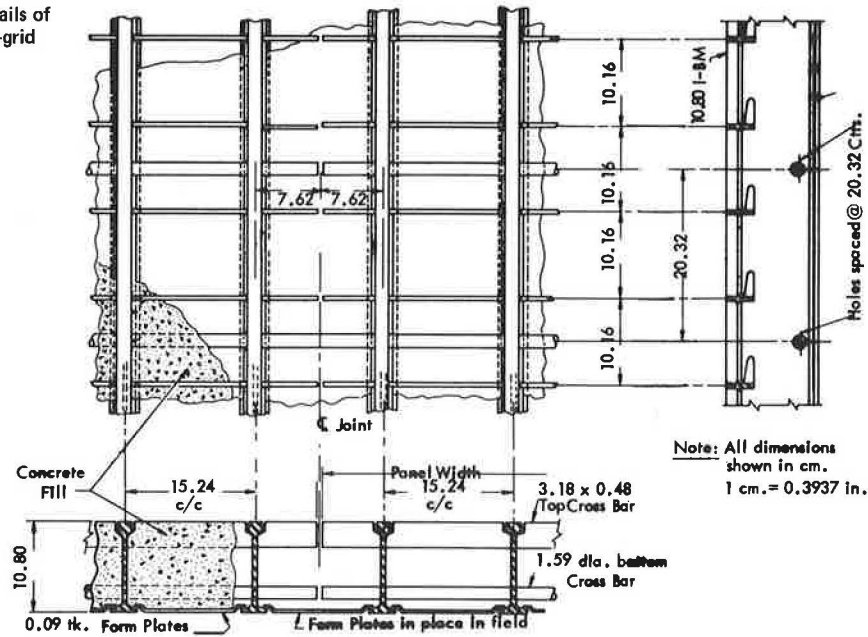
Welding requirements of typical concrete-filled steel-grid floor.
